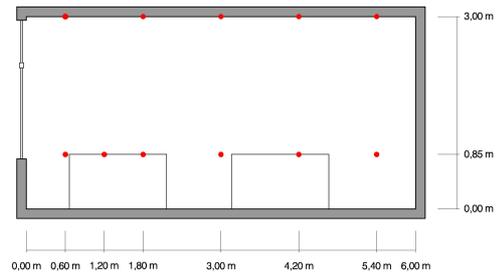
Section of the Test room/Reference room with the location of the measuring points.
